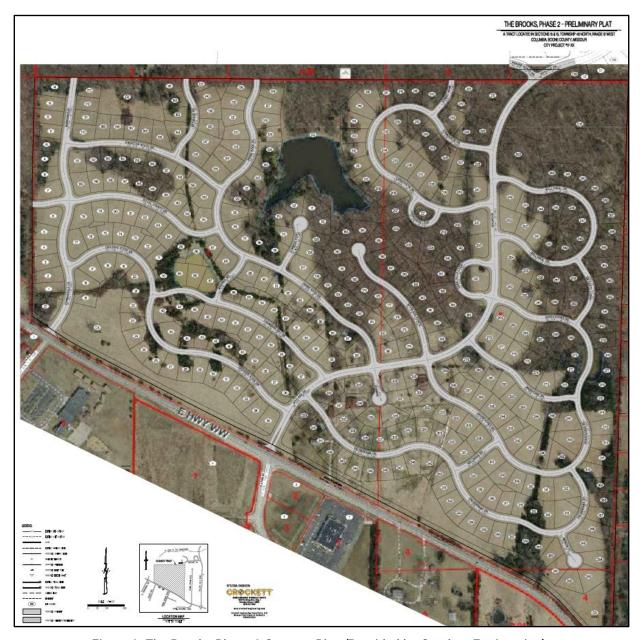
The Brooks Phase 2 Concept Plan (Provided by Crockett Engineering)
